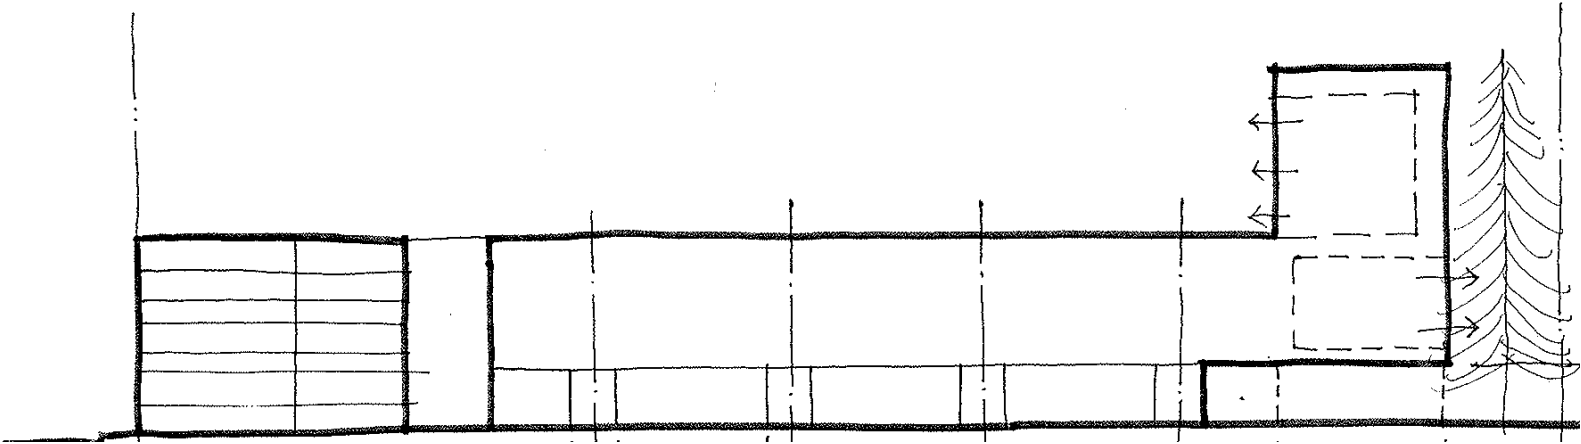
Bellevue Avenue E facade from April 21 proposal.
